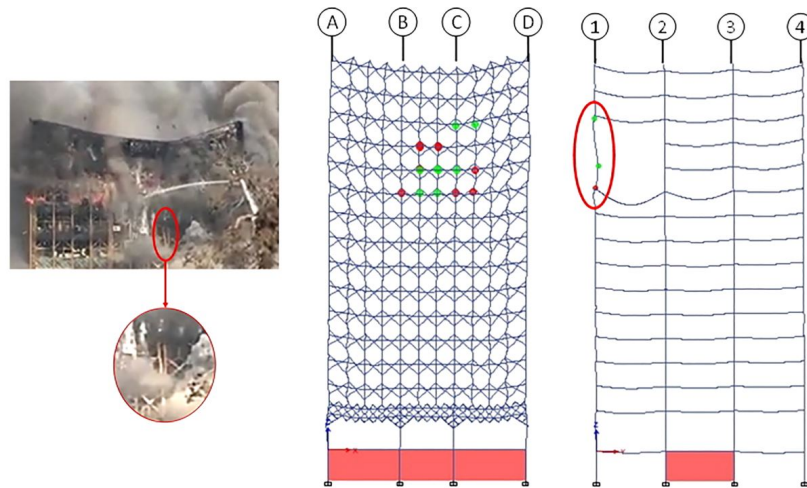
The model of Aghakouchak et al. shows that multiple floor trusses had failing connections, causing the façade columns to fail due to buckling [33].
